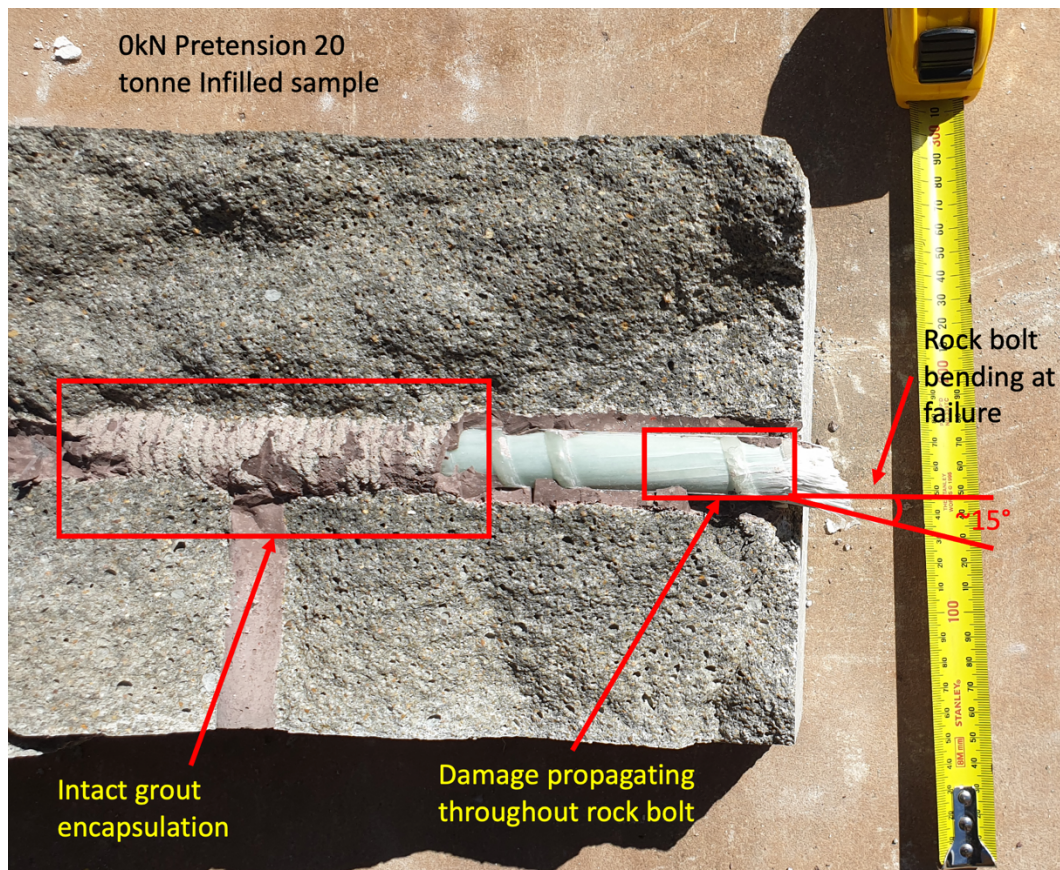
Angle of failure and rock bolt damage for 20-tonne 0kN pretension infilled rock bolt sample
